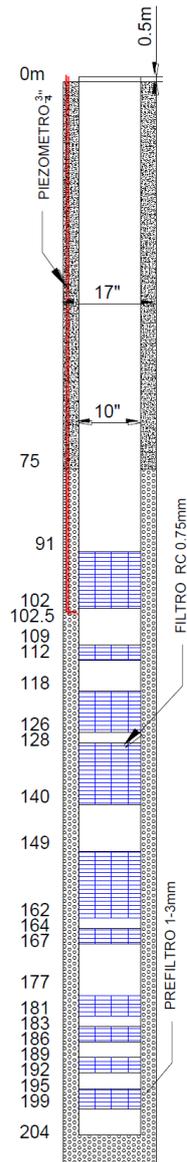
Casing and well construction details for TW-10 bore at Valle de las Burras
